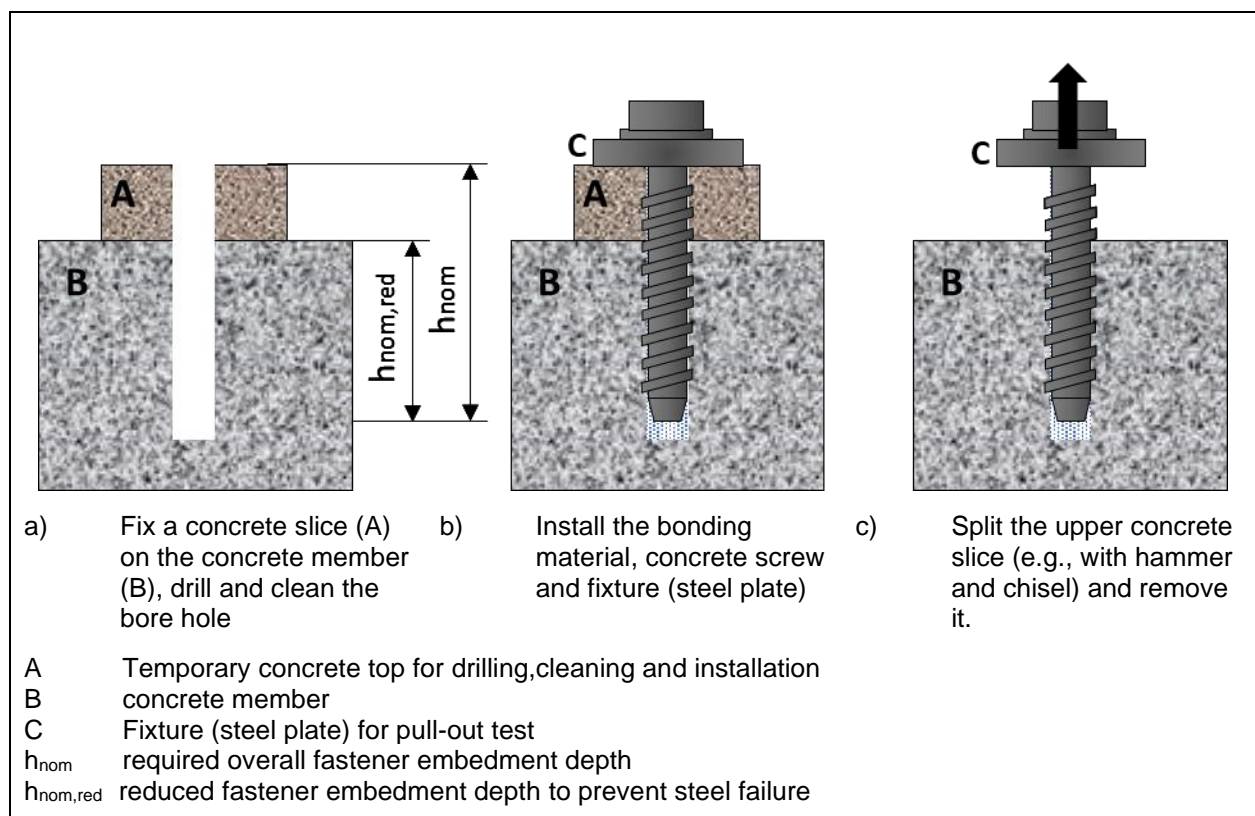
Test setup to avoid steel failure.
